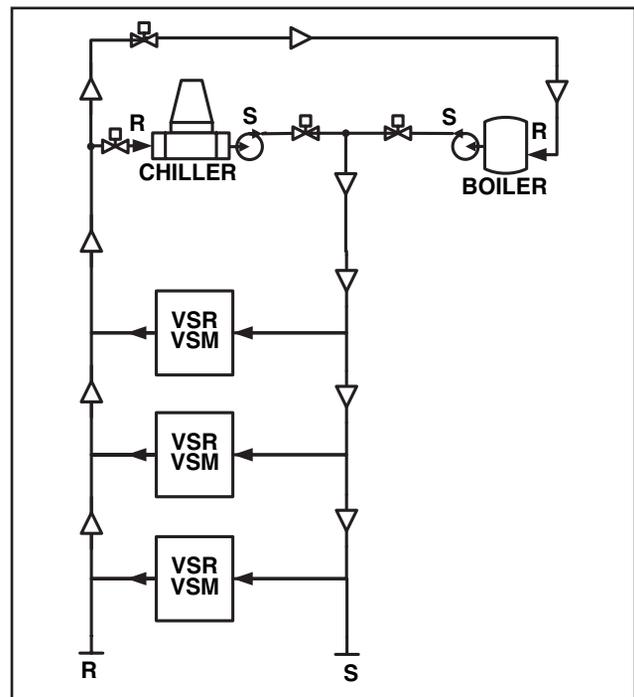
Piping Layout for a Vertical Stack 2-Pipe System with Standard Return Piping
